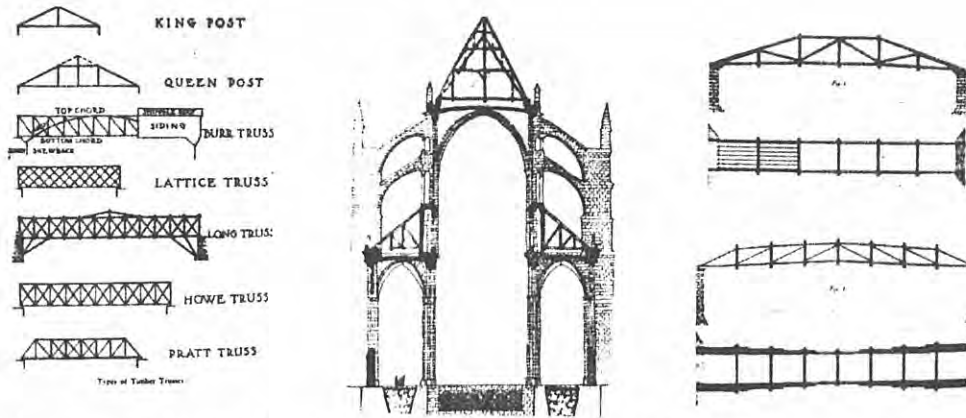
Five American timber bridges (left). The Howe became the Allan truss and the Pratt became the DeBurgh truss. But Medieval roof trusses and Palladio's bridges were in use centuries before.
